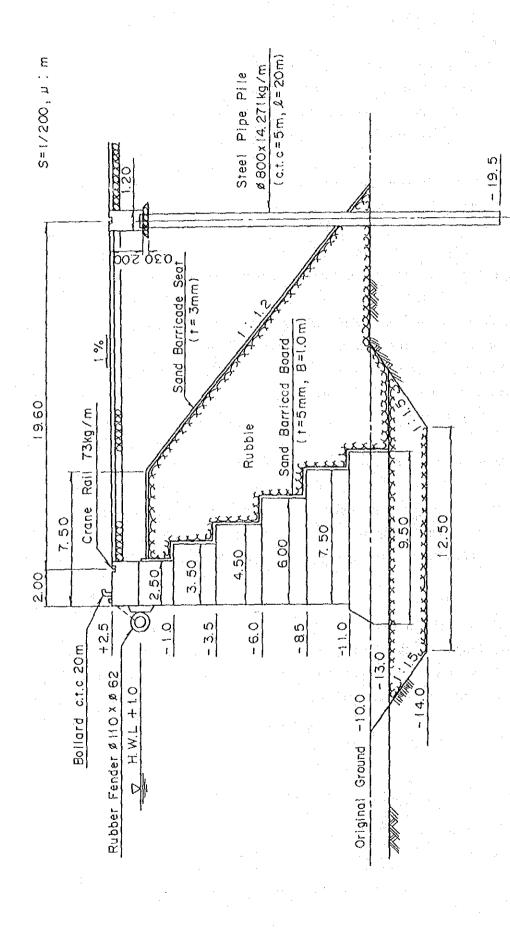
Typical Section of Concrete Block Type Quay
